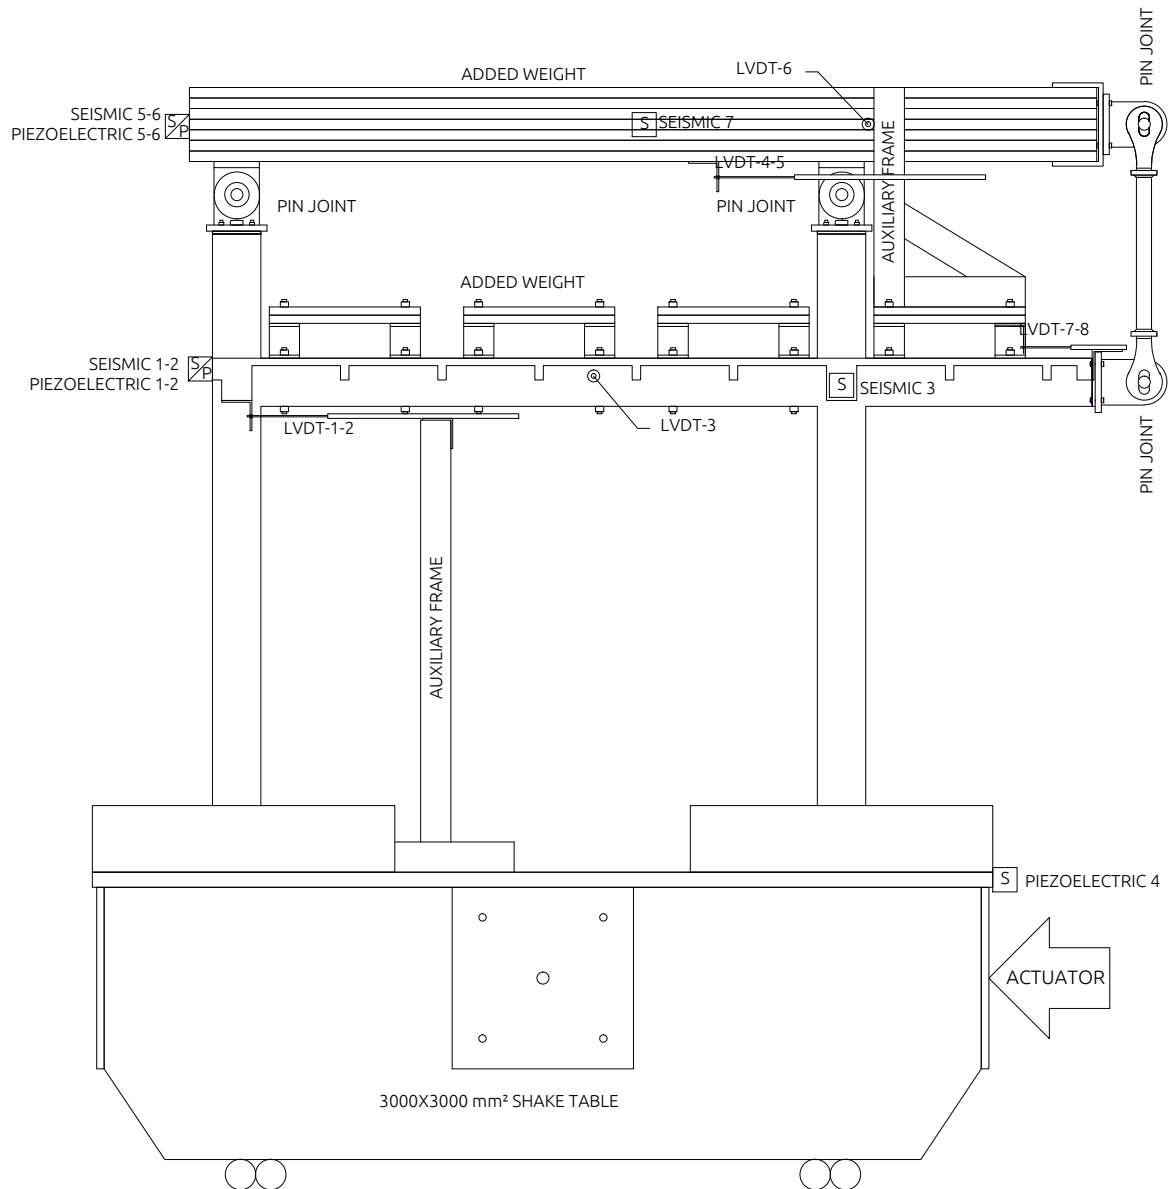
Test set-up and instrumentation. Main frames view.
